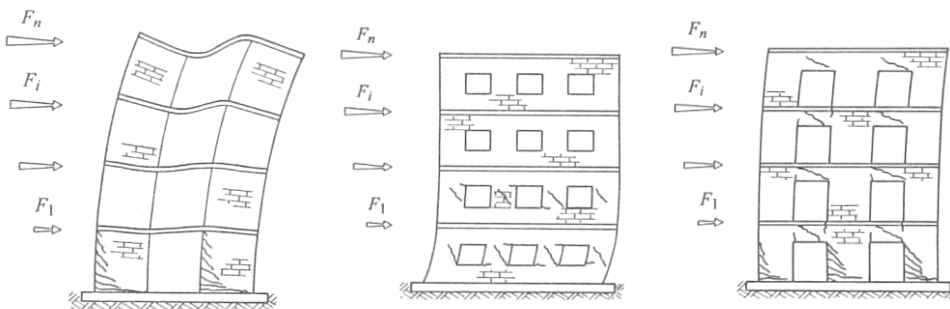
Cantilever walls linked by flexible wall slabs (left), coupled shear walls with weak piers (middle) and coupled shear walls with weak spandrels (right) (from Tomažević, 1999).
